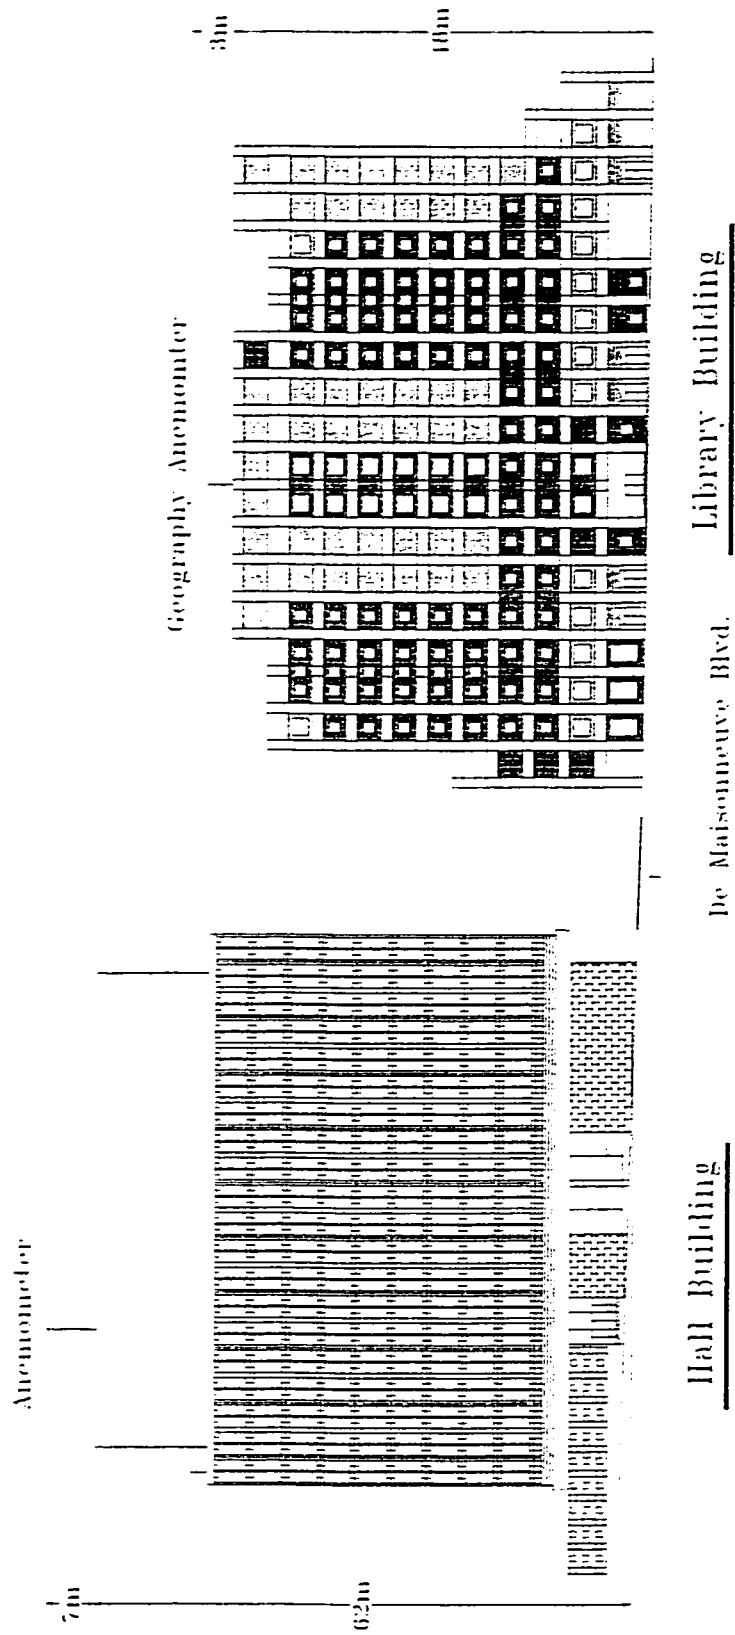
Elevation of Hall Building and Webster Library Building from Mackay Street
